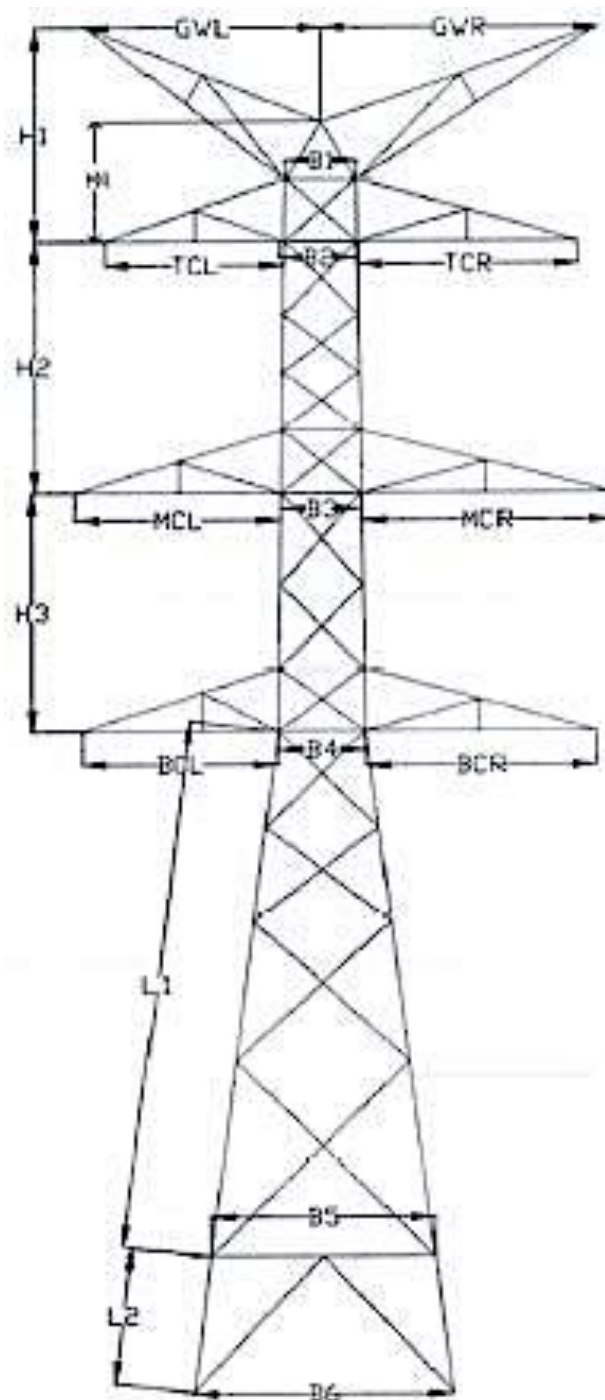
Schematic Drawing of 230kV Double Circuit Tower
